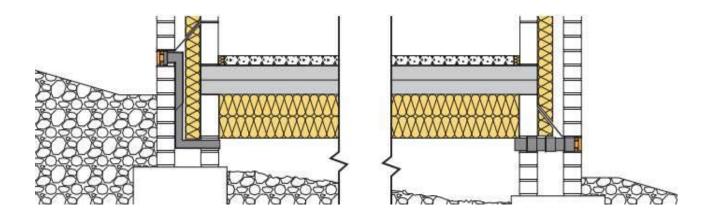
This section shows how the under floor ventilation is used and how it works. (Products 2013)
